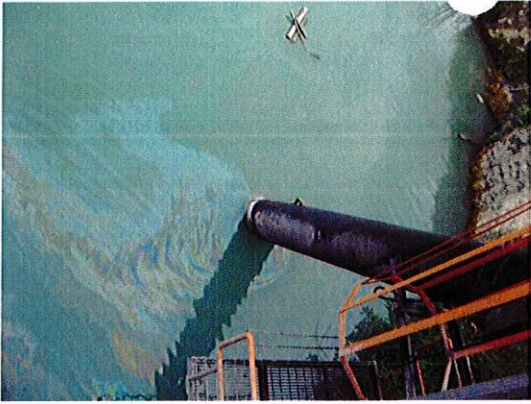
/11:02 AM – Intake structure for alternate pump, notice oil sheen.
